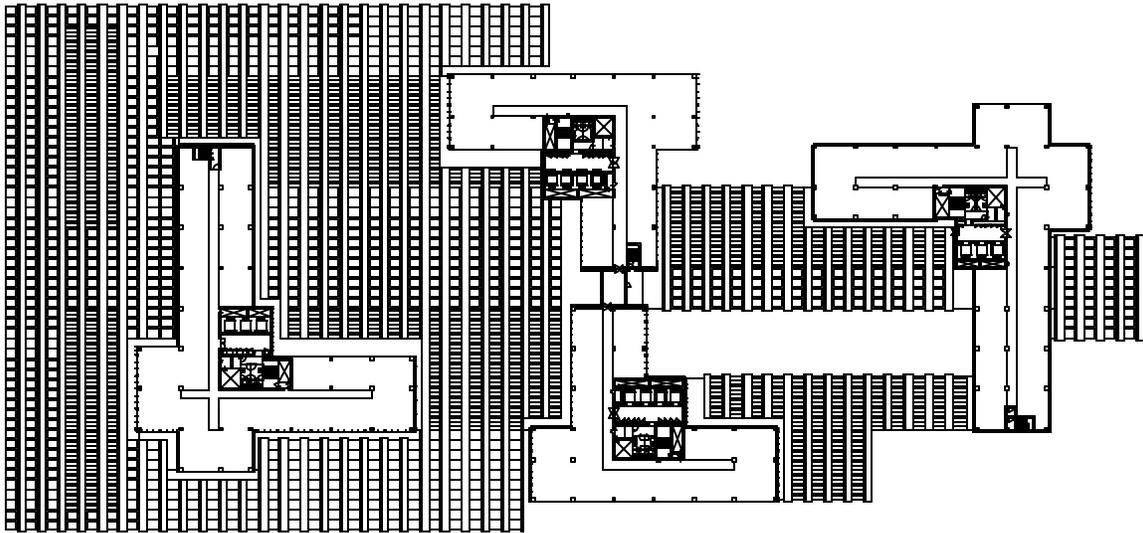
Roof Plan of WTC, not to scale (courtesy of KPF)
